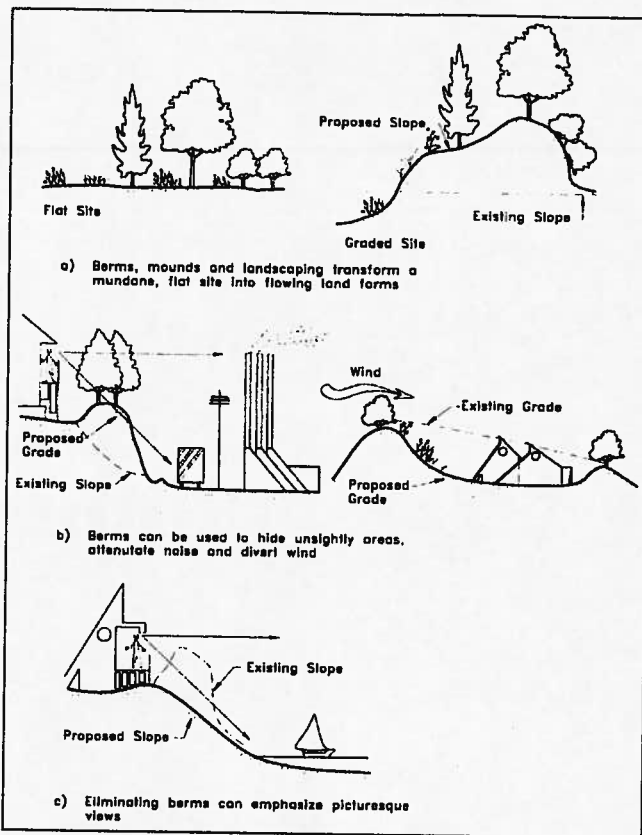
Grading to improve aesthetics. (Courtesy of Nelis-cher, Maurice, ed. *Handbook of Landscape Architectural Construction*, vol. 1, 2nd ed. Washington, DC: Landscape Architecture Foundation, 1985)
